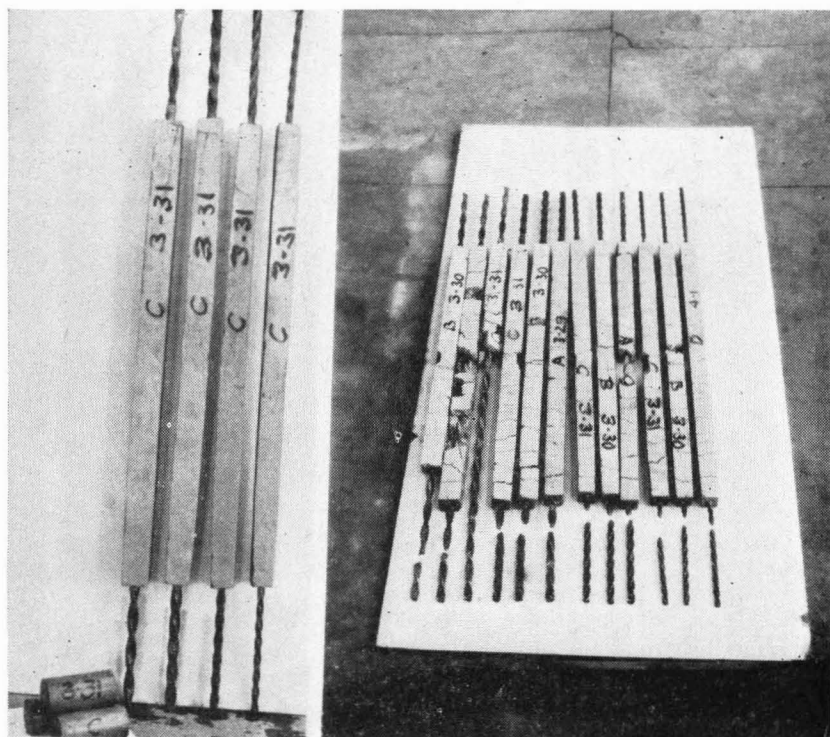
(LEFT)—FOUR SPECIMENS BEFORE TESTING
